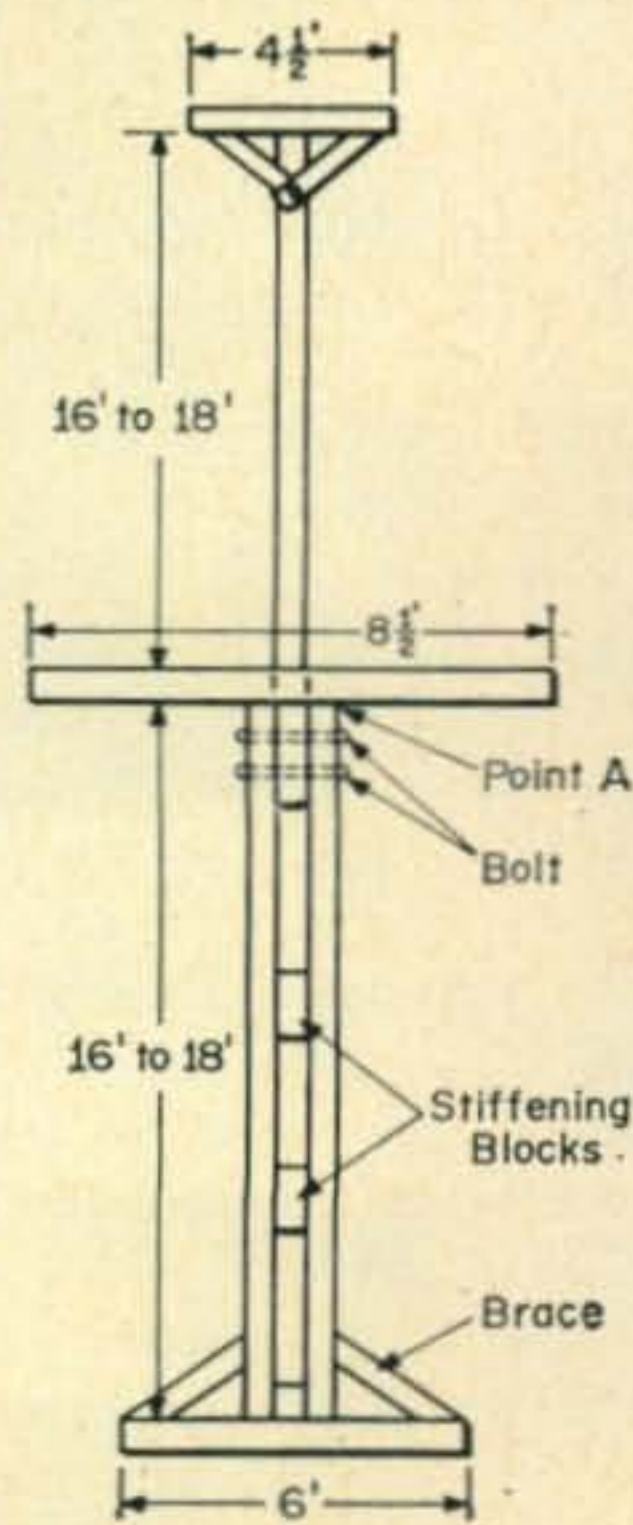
Construction details of the two masts. Materials can be 2×2 , 2×3 or 2×4 but 2×4 is strongly recommended. If desired, the masts can be constructed A frame style instead.
